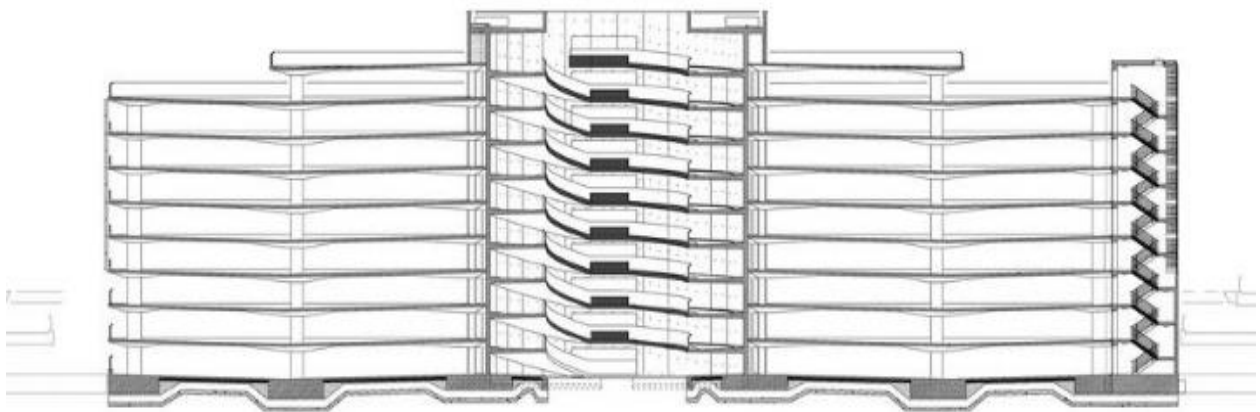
Hamburg Airport's "Rotunda" parking; Elevation
